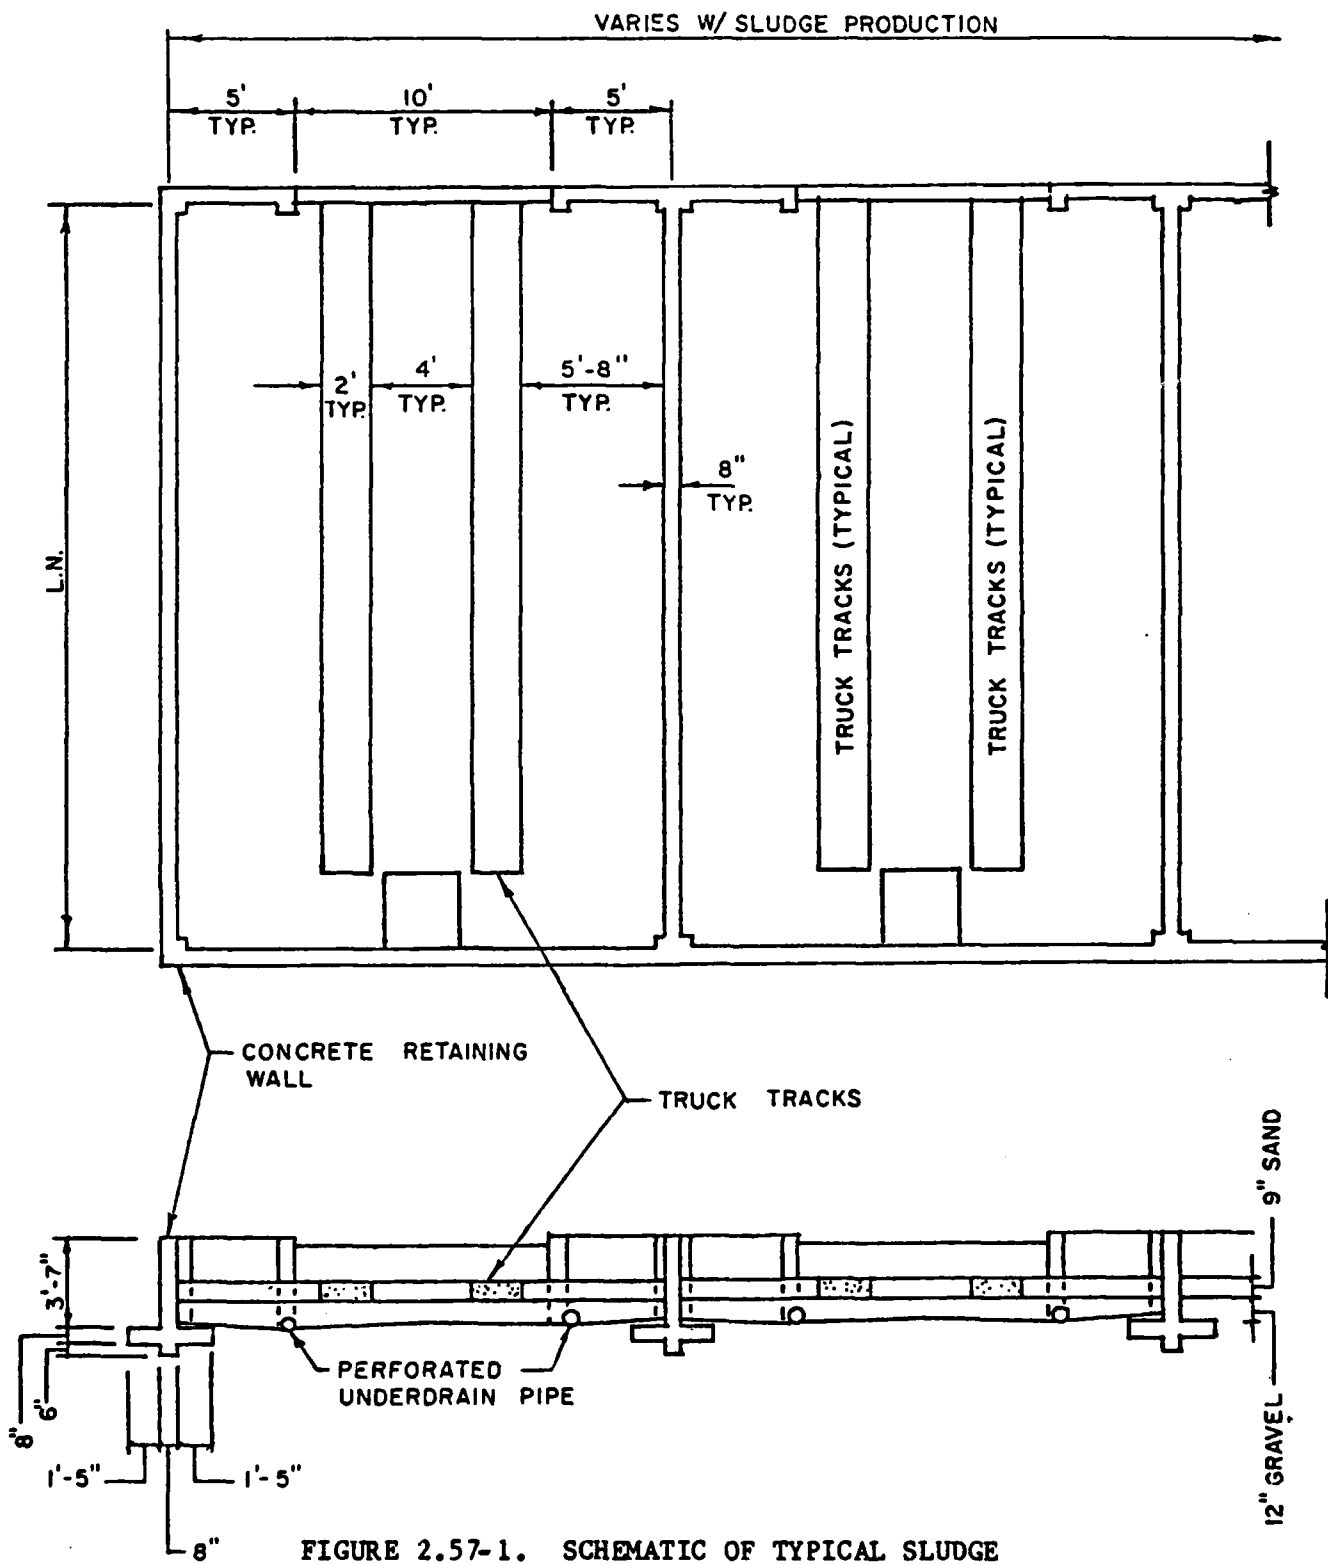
SCHEMATIC OF TYPICAL SLUDGE DRYING BED
